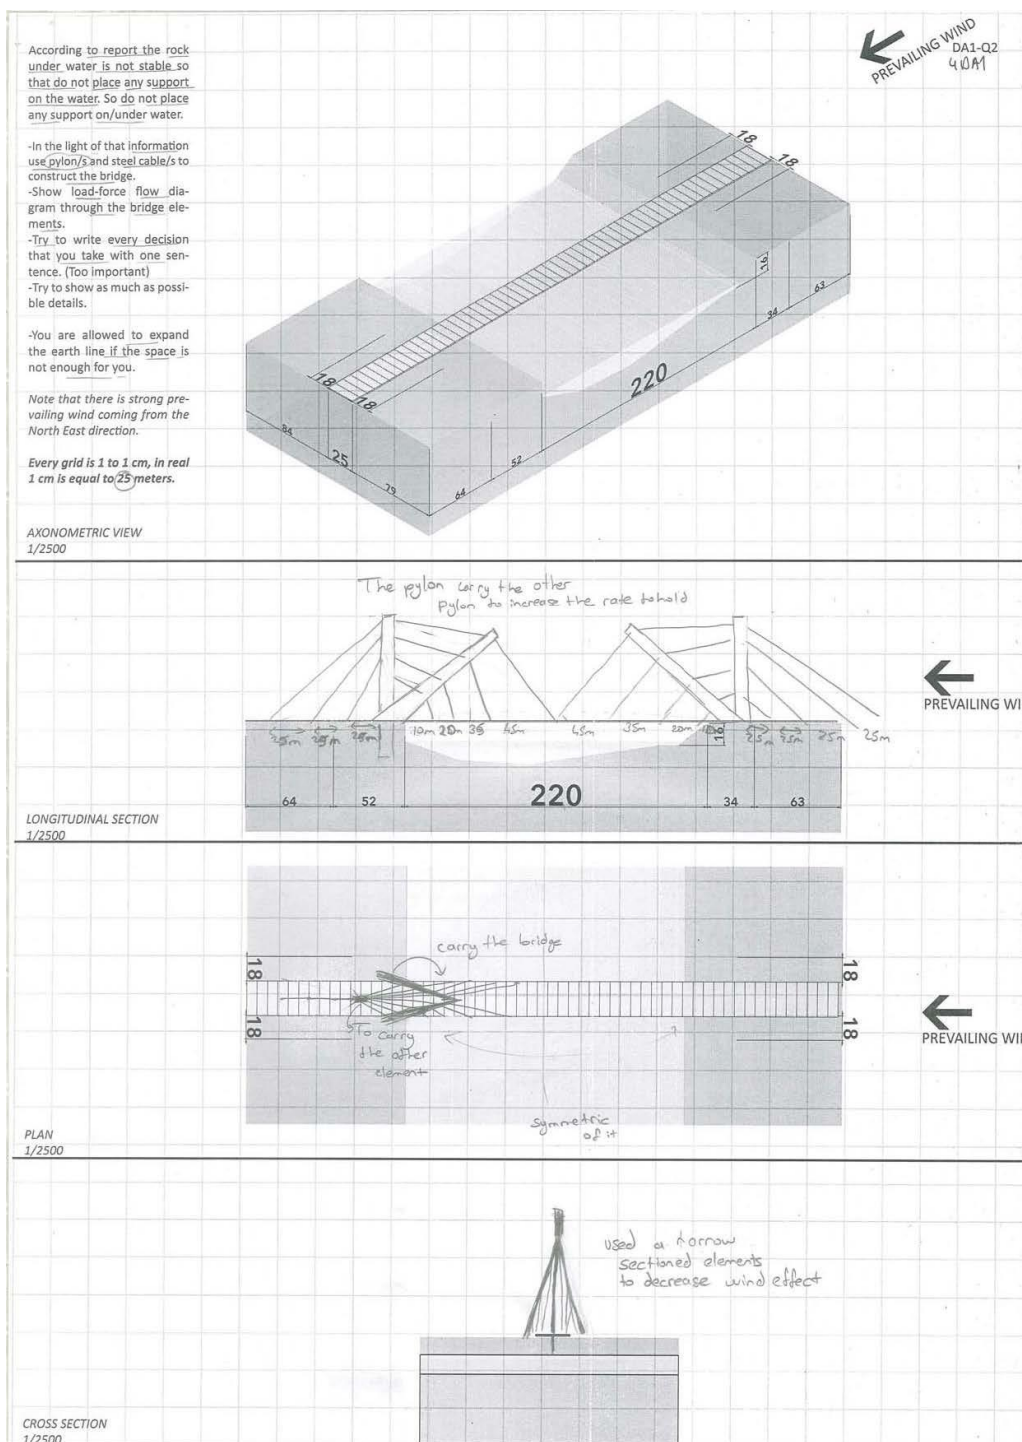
Participant 4 DA-1 Shorter-Span Bridge Question
